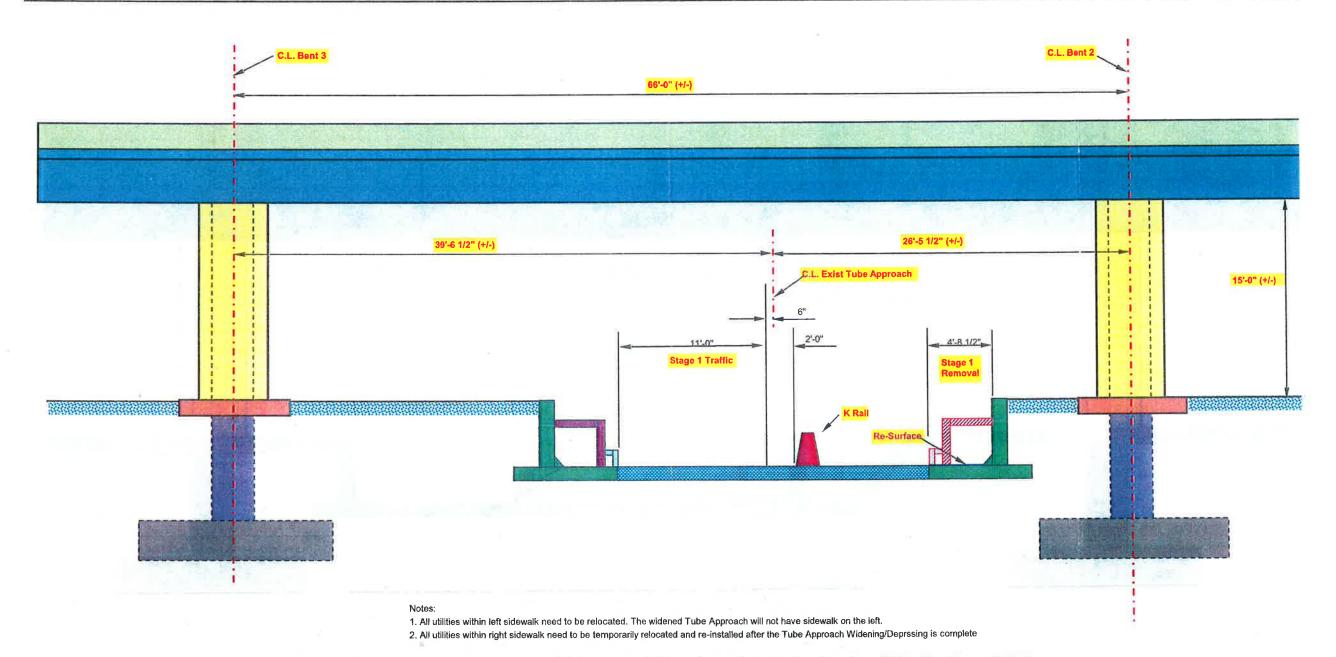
Stage 1 - Remove Right Lane Sidewalk and Curb, Re-Surface This Portion of Slab
